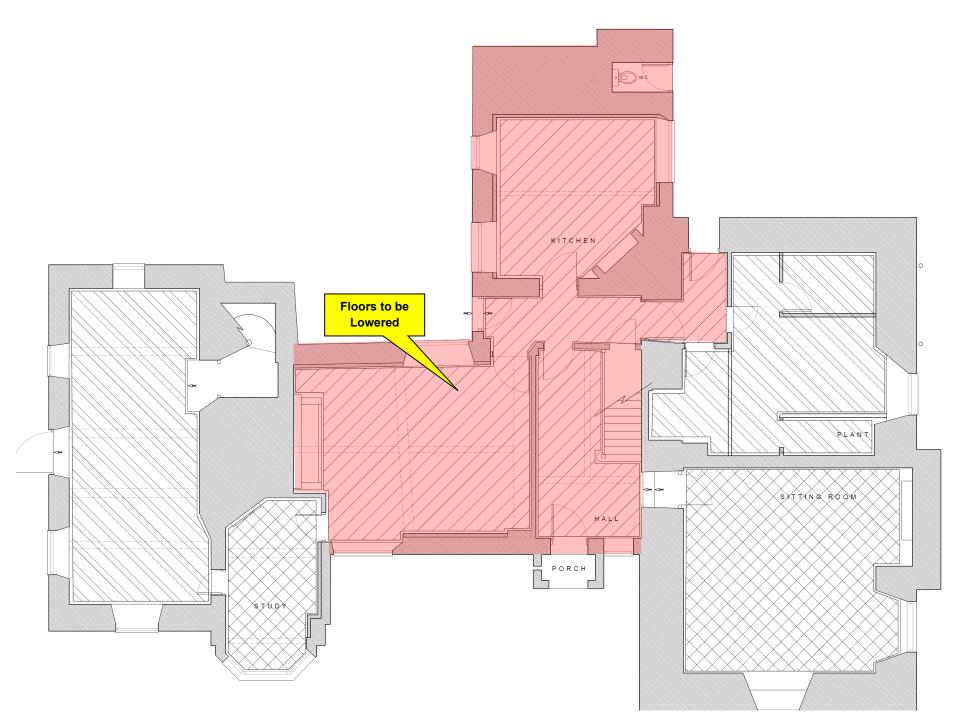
Ground Floor Surfaces to be Lowered (not to scale)
